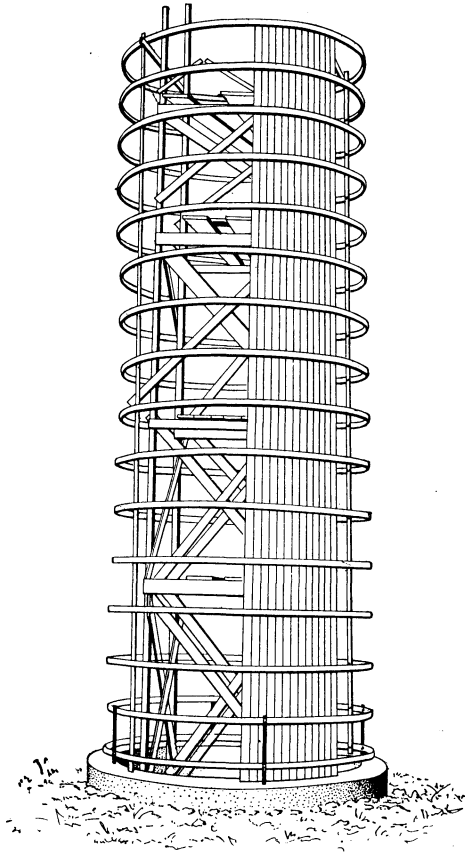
Wooden-hoop silo started with scaffolding, hoops and several staves in place.
